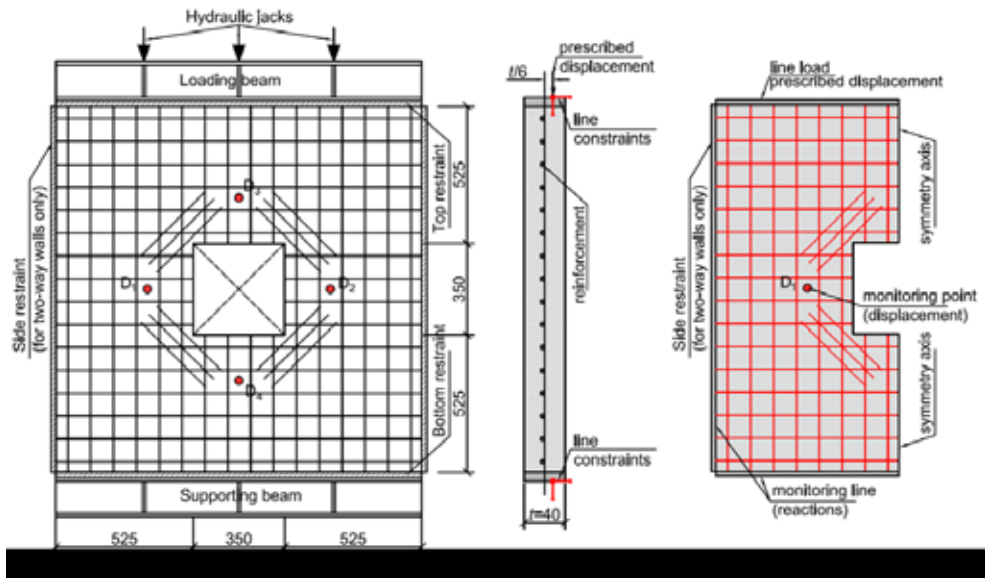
Details of the test specimen: a) test setup adapted from Lee [12] and b) simplified numerical model
